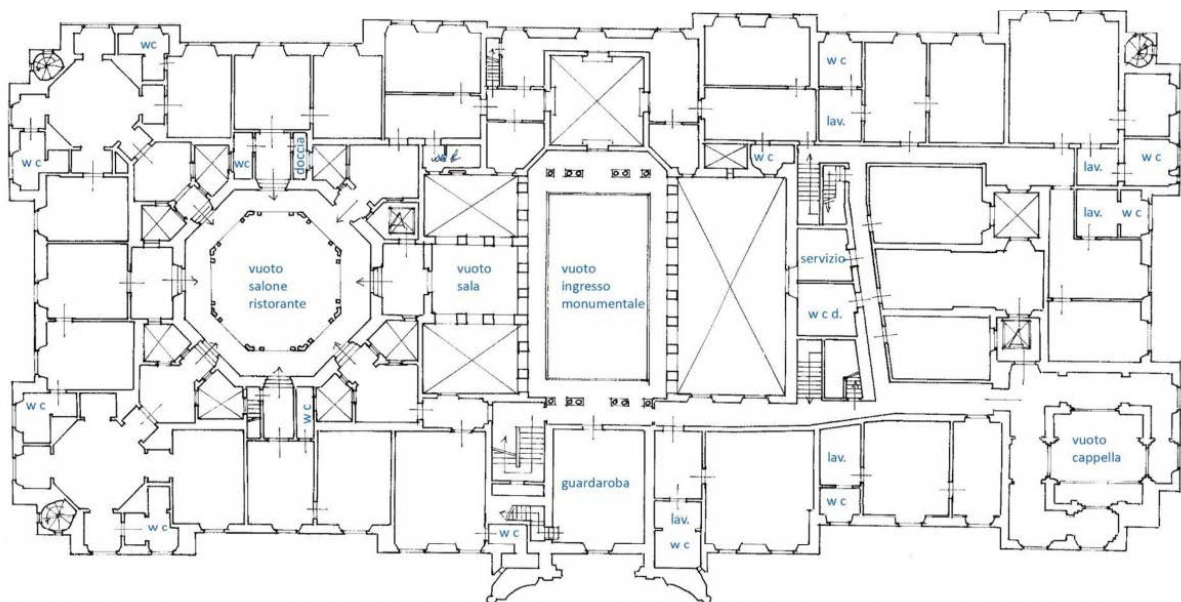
SECOND FLOOR PLAN BY COLDWELL BANK COMMERCIAL
